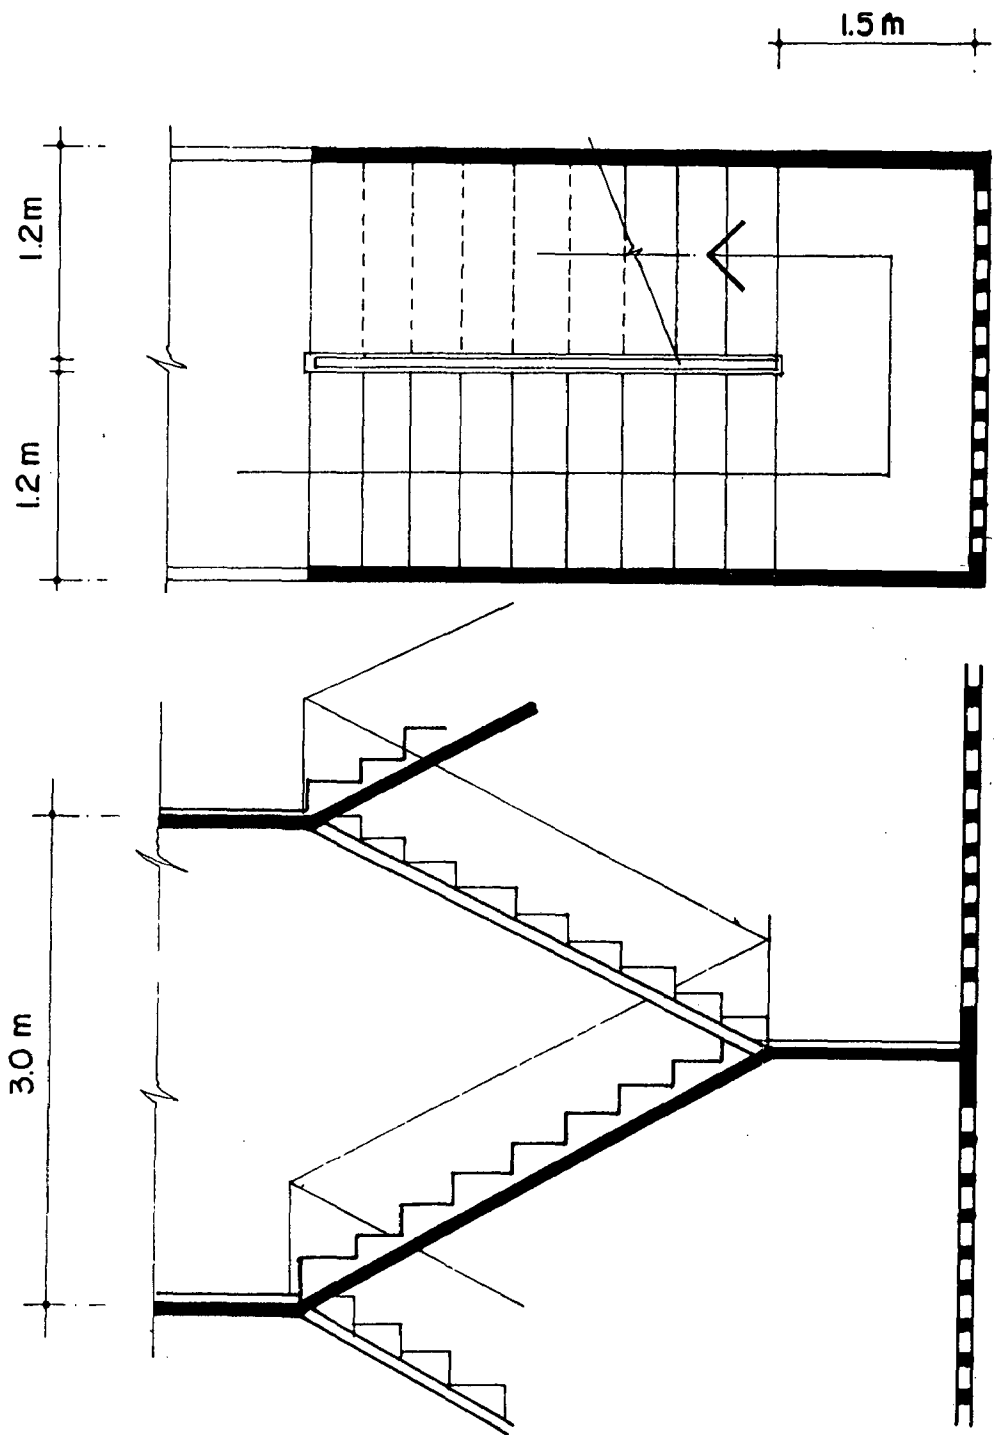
TYPICAL PLAN & SECTION FOR A STAIRCASE
